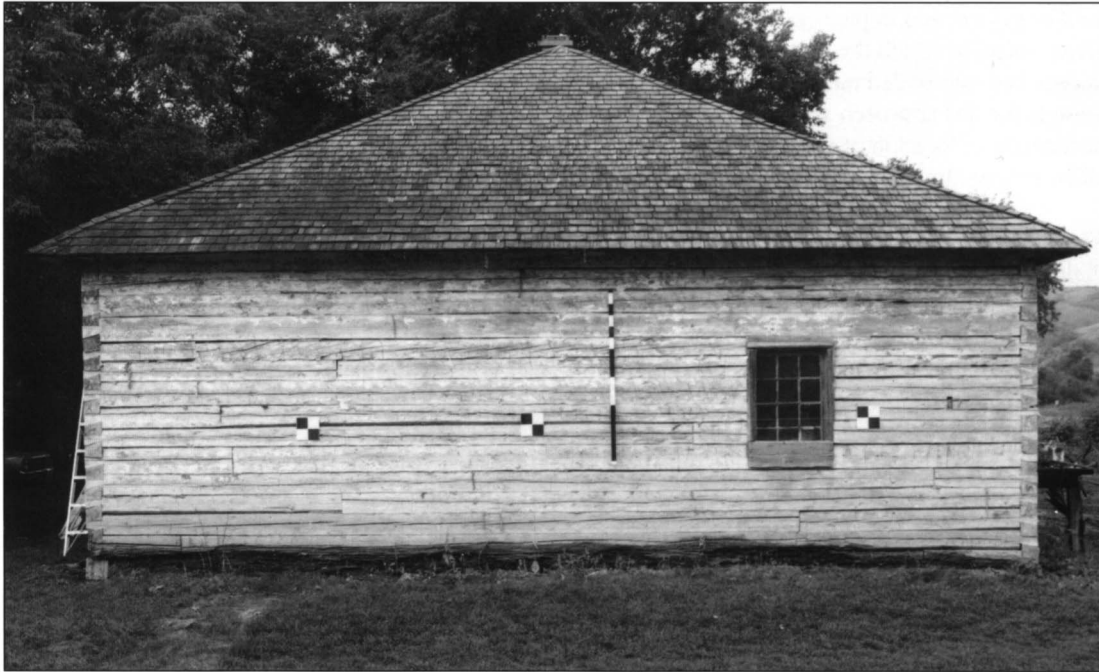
It is not always necessary to produce measured drawings, particularly of simple buildings. Using common equipment and simple techniques, a single photograph can be used in place of a drawing. Dimensions can be taken from the plane on which the scale bar has been positioned. Targets placed on a level line at known distances can also be used to obtain accurate dimensions from photographs.
